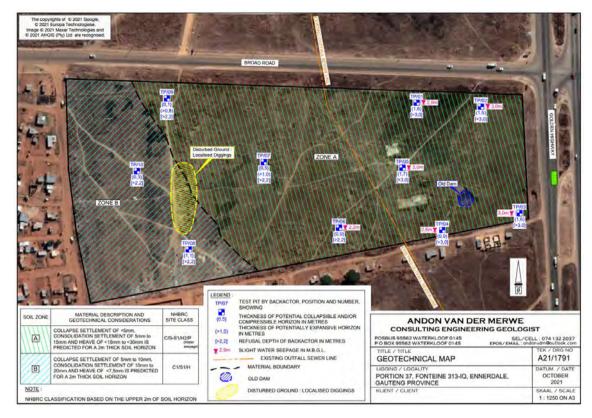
Test pits on Portion 37 (Copied from Report No. A21/1791)
